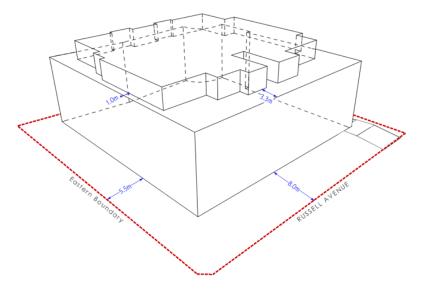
Indicative building envelope with minimum setbacks indicated (north-east view)
